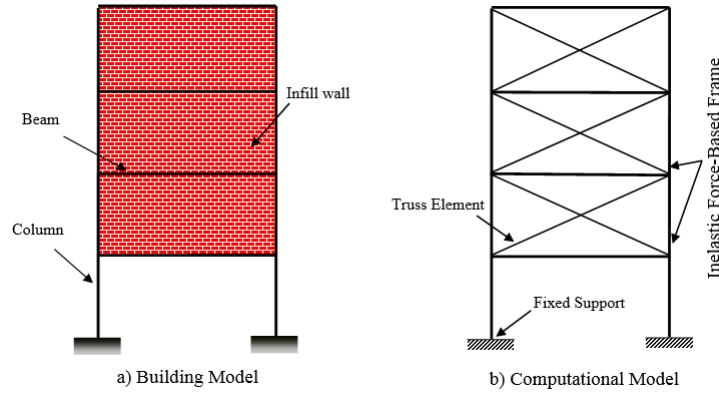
Typical building model and corresponding infill wall panel element (Crisafulli, 1997).
